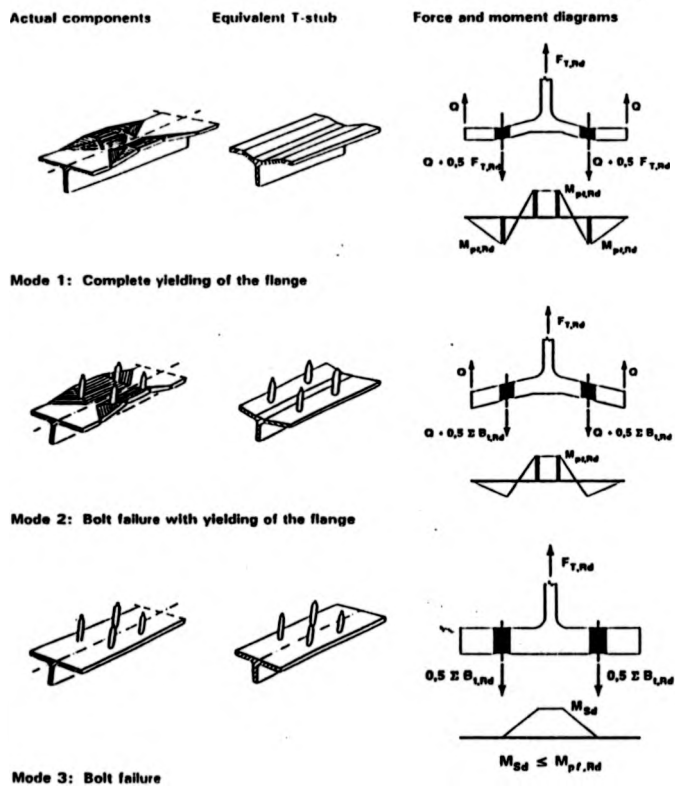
Failure modes of actual components and equivalent T-stub flanges
